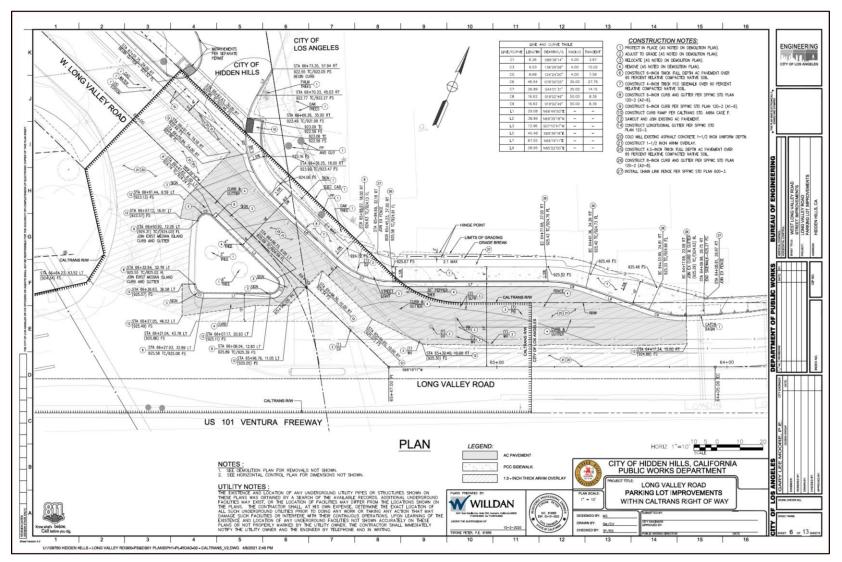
Parking Lot Improvements Plan – Caltrans ROW
